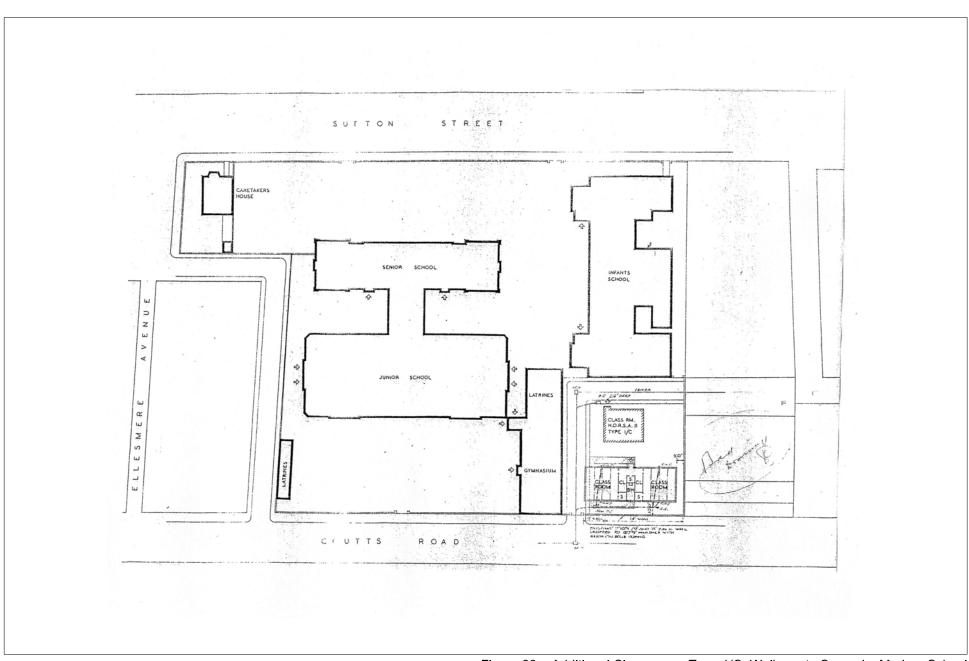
Additional Classroom - Type 1/C. Walkergate Secondry Modern School Drawing No. SBG/1. February 1947, Ministry of Works for Newcastle M. of E Original scale: 1/16 inch to 1 foot
